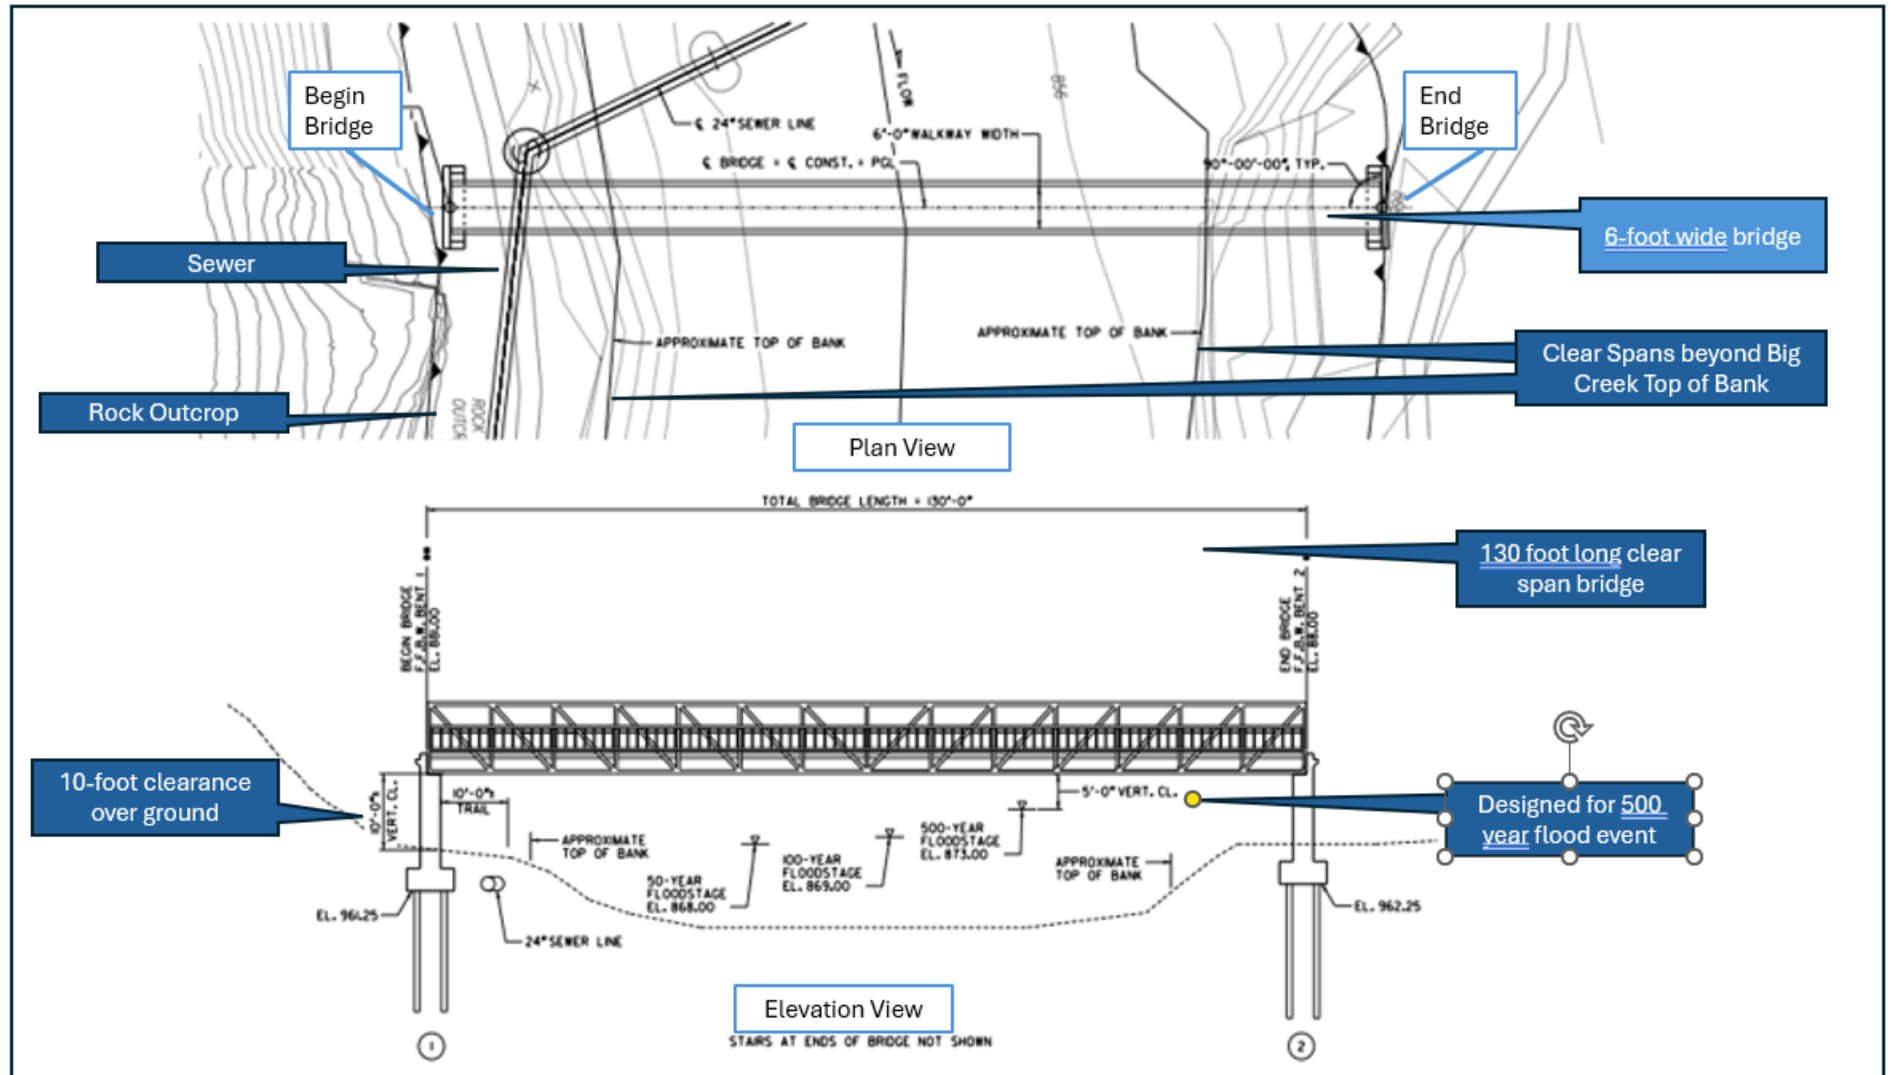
Example Rendering of Proposed Pedestrian Bridge over Big Creek
